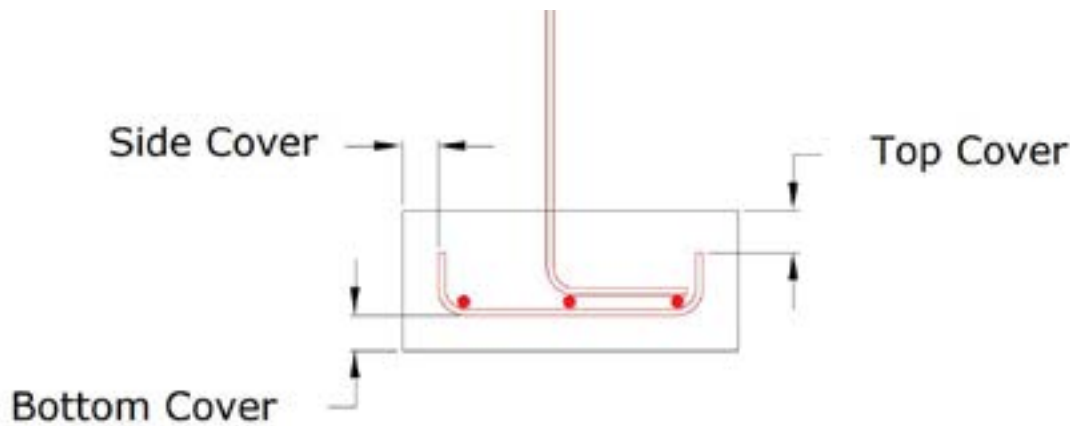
CONCRETE COVER TO A REINFORCED CONCRETE STRIP FOOTING
